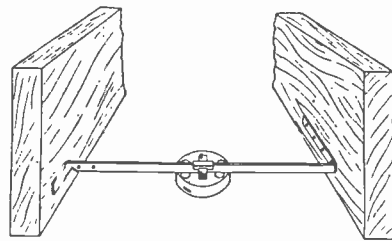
A metal bar or hanger is used to support outlet boxes between the joists.
